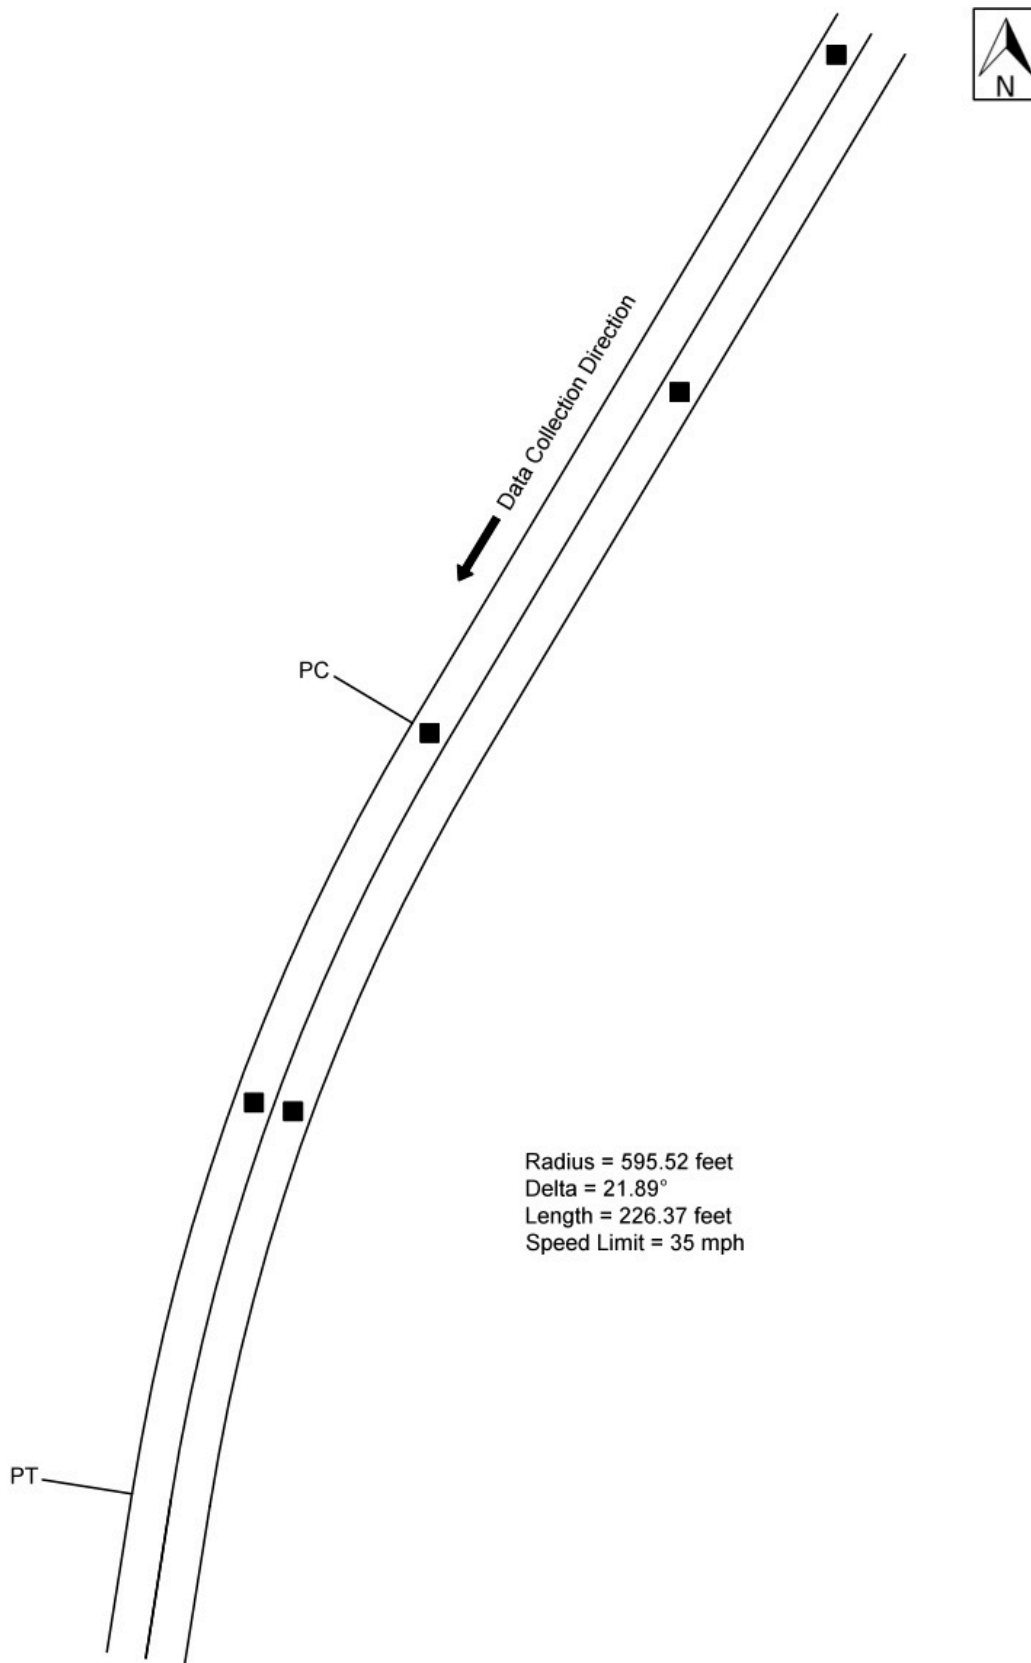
Diagram. Geometric layout of southbound New Boston Road (not to scale).
